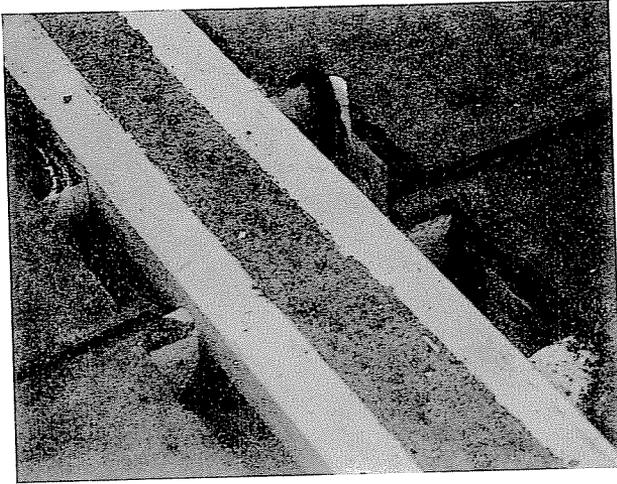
Junction between floor units and beam.* When the floor unit is lifted in position, its "noses" exactly face windows in the beam. Now, the reinforcing strips fold out from the butt end, as a temporary support for the floor. The opposite steel strips meet within the window. The windows and the noses are seen to form a U-shaped open channel. By pouring in this channel, a homogeneous joint comes about, the structure becomes monolithic. This joint actually is a technological translation of riveting of steel structures into the language of r.c. tissue structures.
